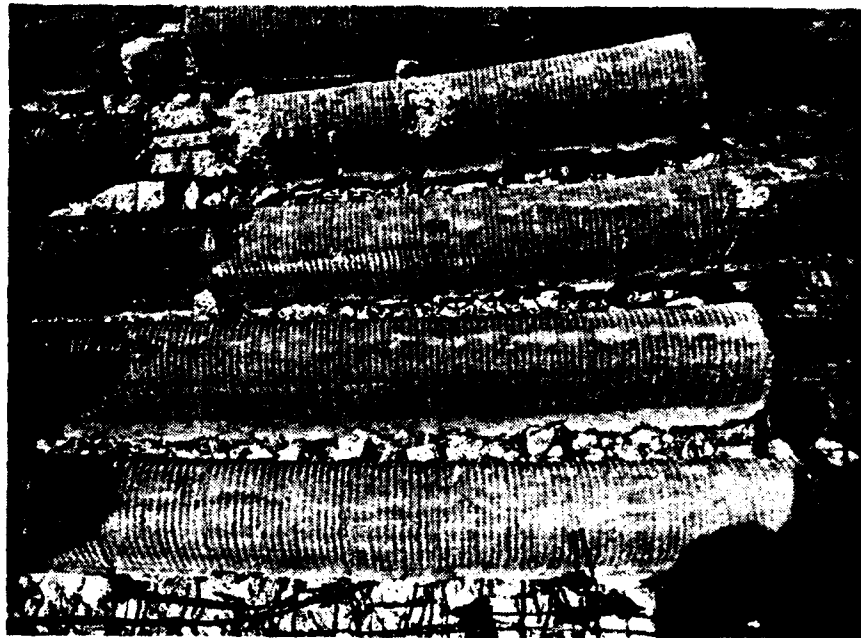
Tension cracks at transverse failure plane, PAS-4.
